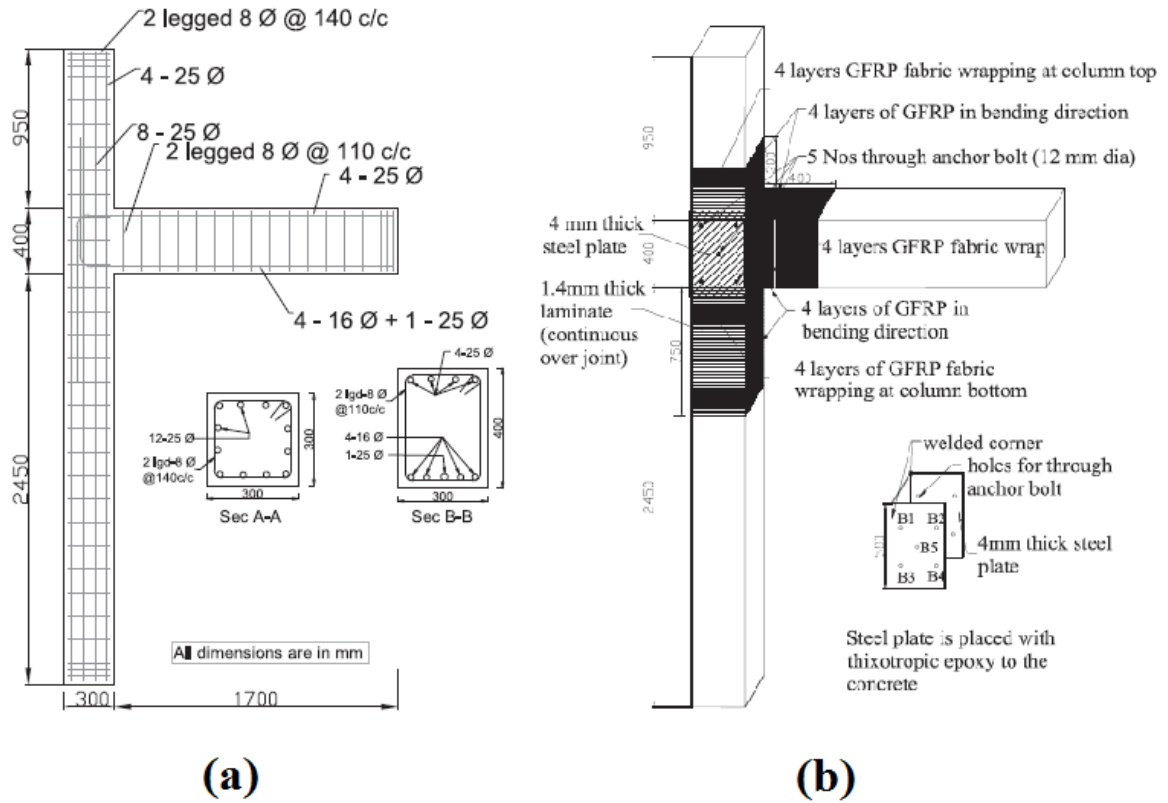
Reinforcement details of 'Non-Ductile' specimen and (b) Retrofitting scheme for damaged 'Non-Ductile' specimen [(Sasmal, Ramanjaneyulu et al. 2011)]
